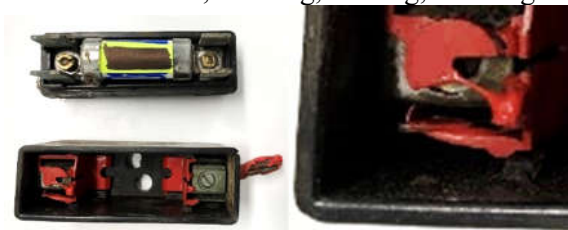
Example of melted cable insulation and melted red plastic inserts
